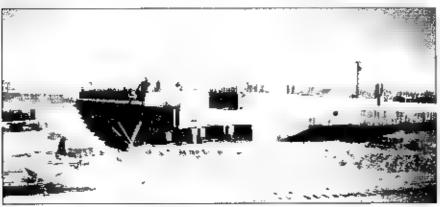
The concrete work for the basement of the Civil Engineering Wing completed view newards N.E. December 1963 and 1963.
